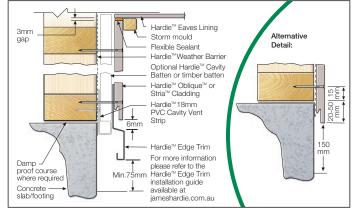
SLAB/EAVE JUNCTION DETAIL
